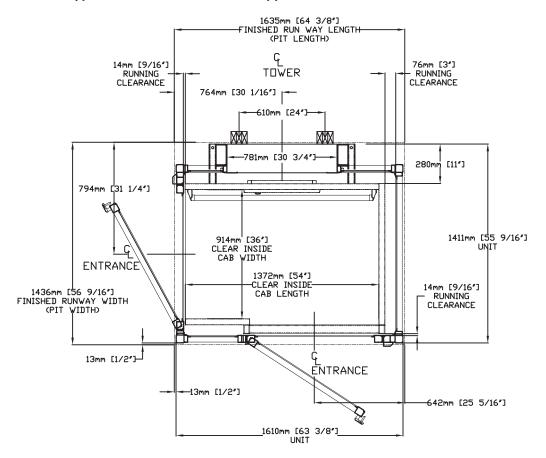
Plan View - Type 4, 36" x 60" Cab, Hoistway Application
